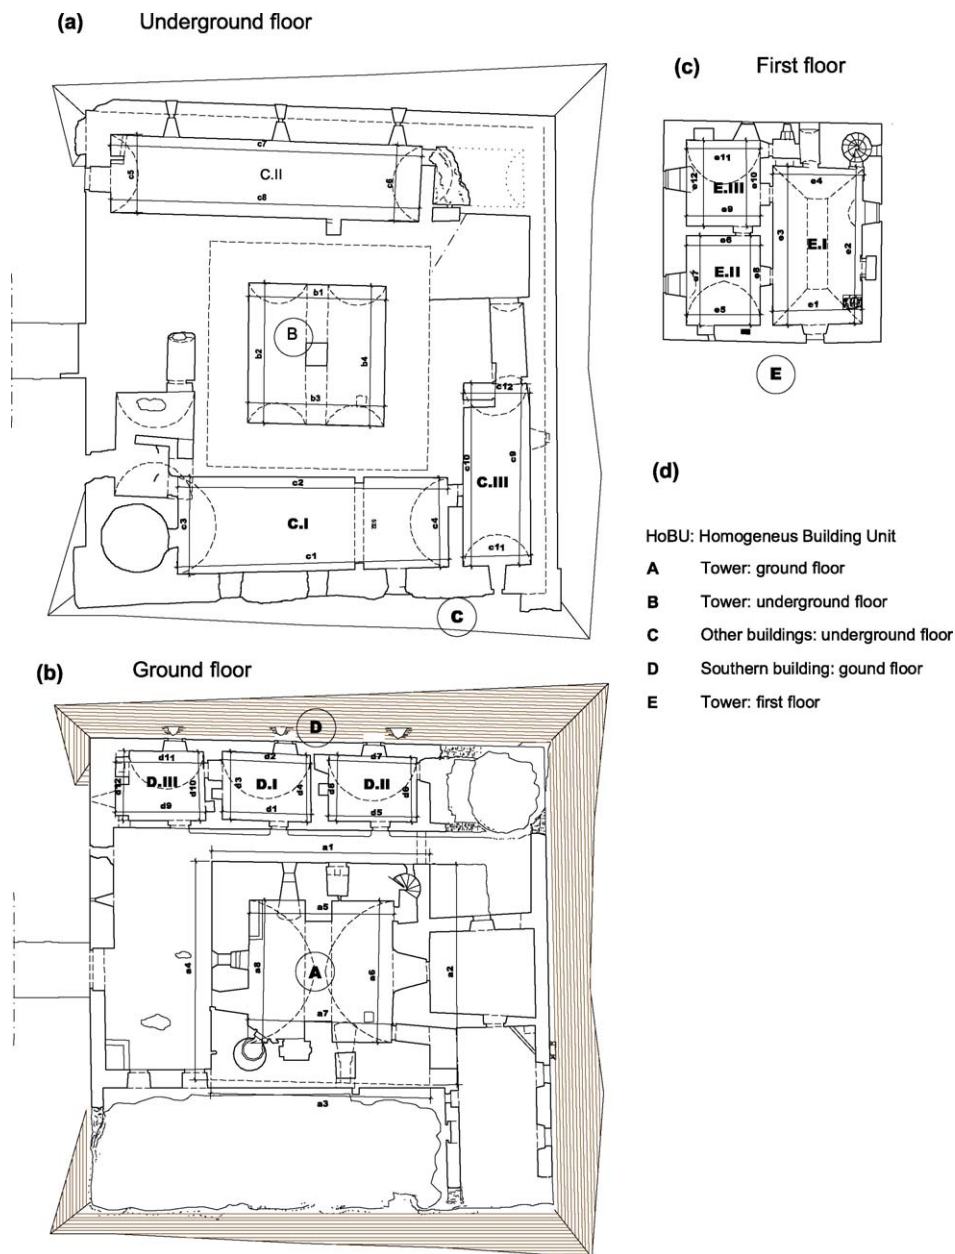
Castle of Monte Serico. (a) Underground floor plan; (b) ground floor plan; (c) first floor plan and measurements considered; (d) HoBU.
